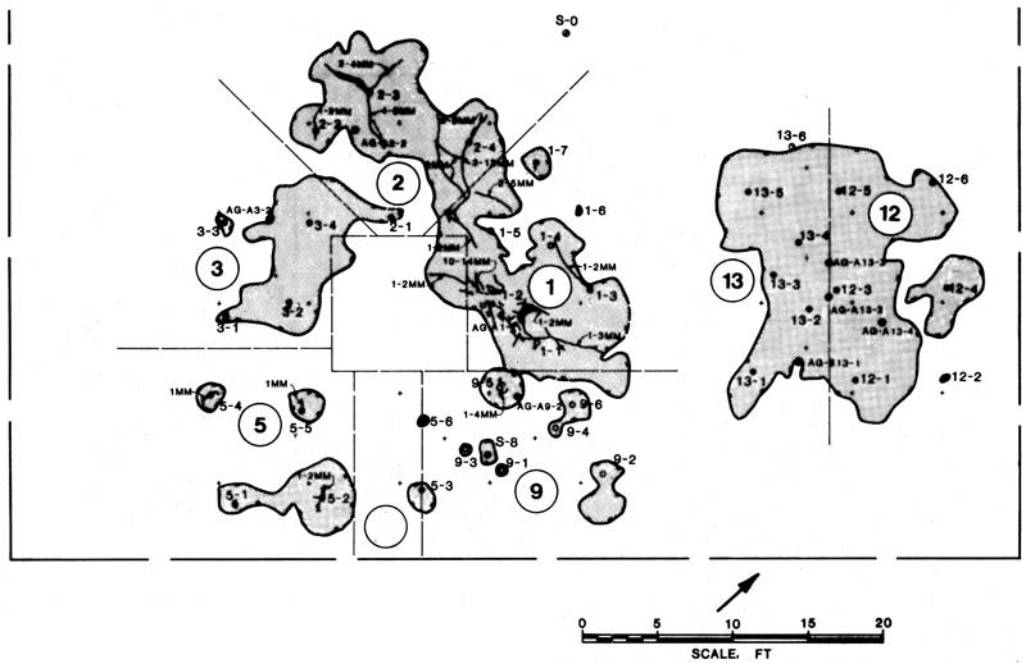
Horizontal section through test area at elevation 390. (From Ref. 2.)
